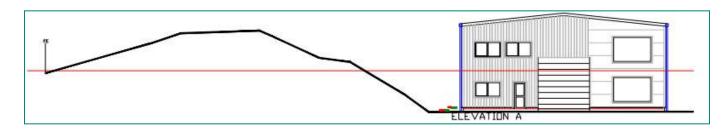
(Extract of front elevation of existing building with the existing adjoining landscaping bund)
